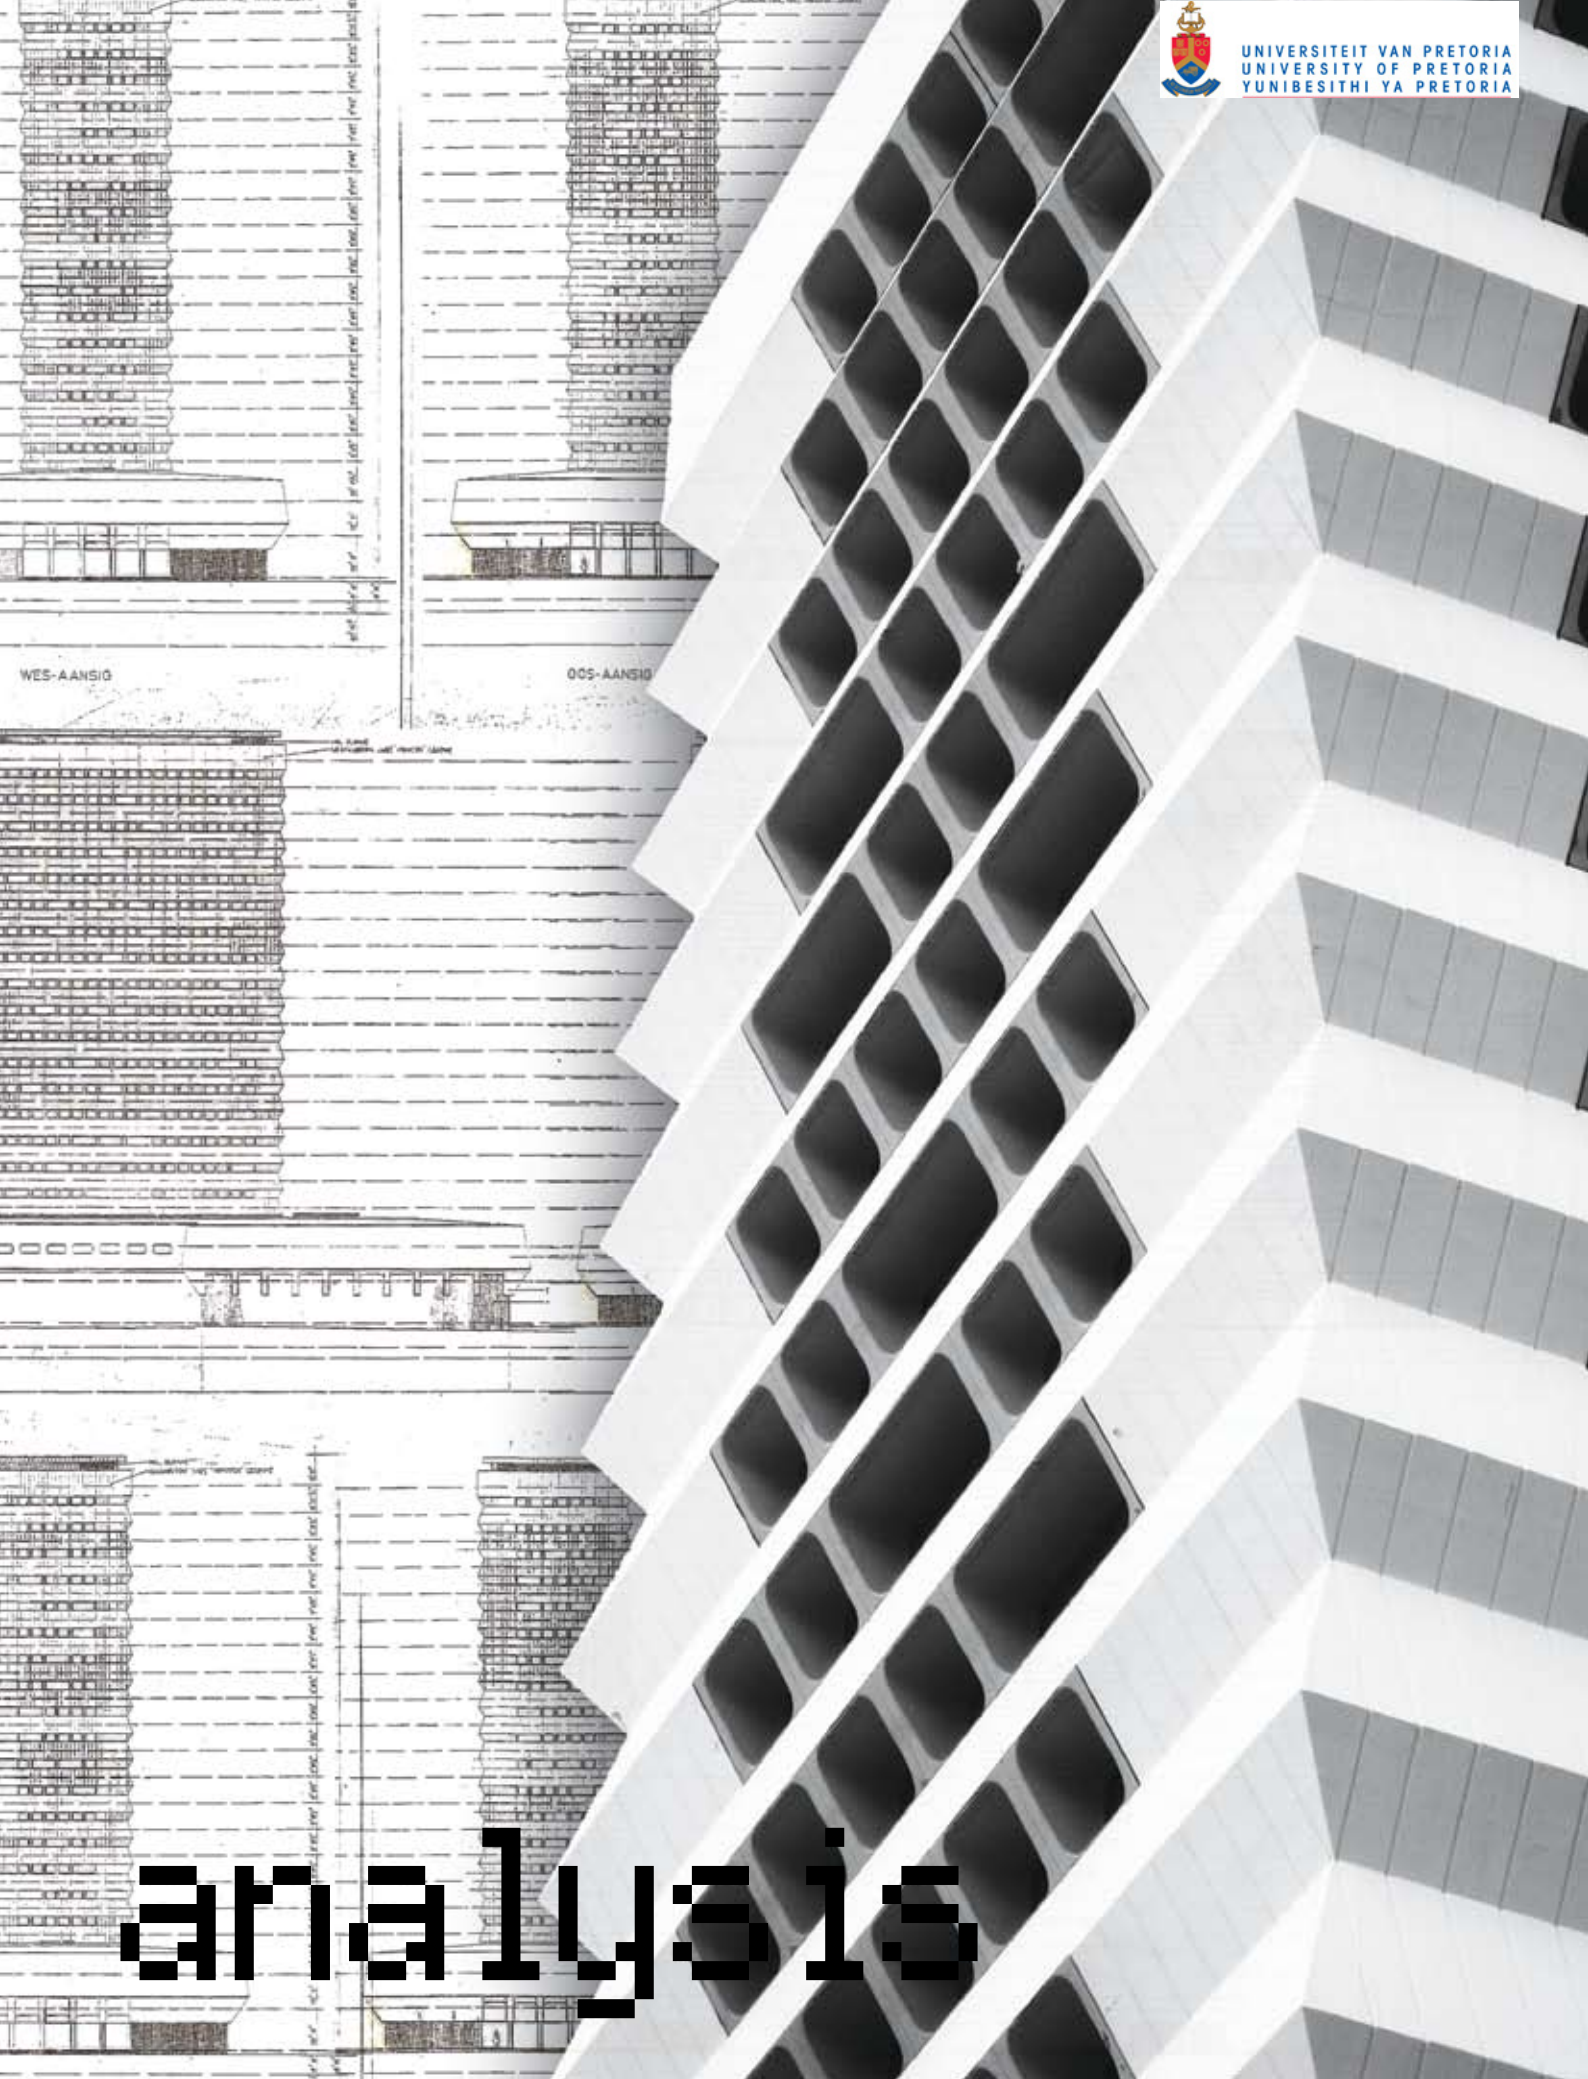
Photograph of the west facade of the Humanities Tower with original hand drawn elevation drawings by Brain Sandrock Architects. [Author, 2008]
